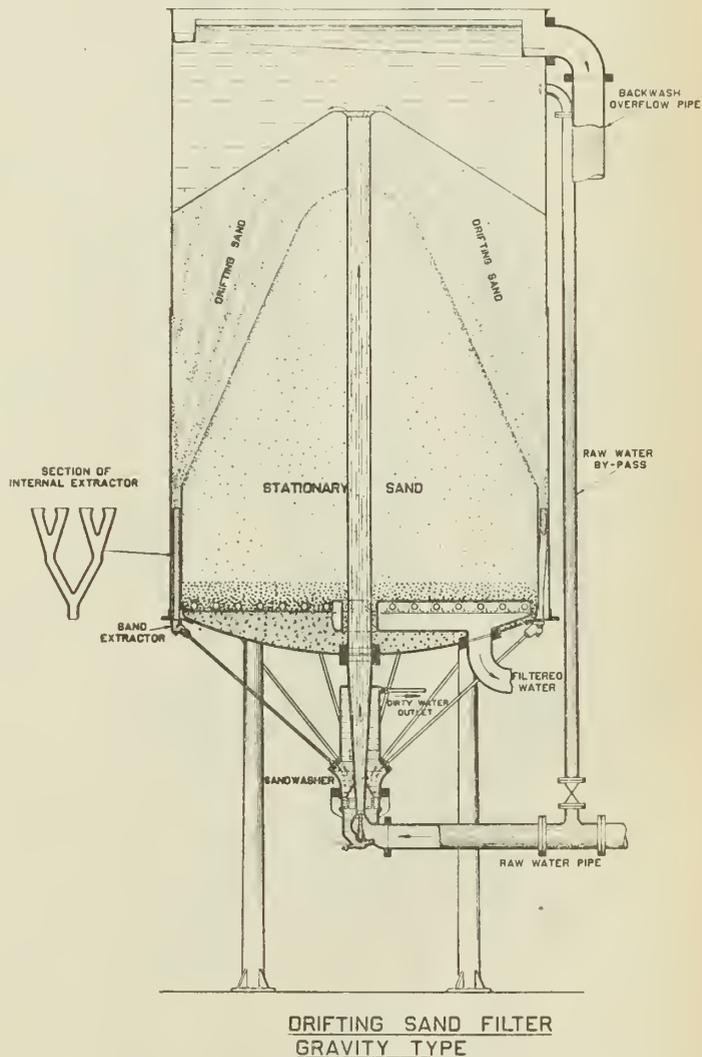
Typical section of Single Unit Drifting Sand Filter.
